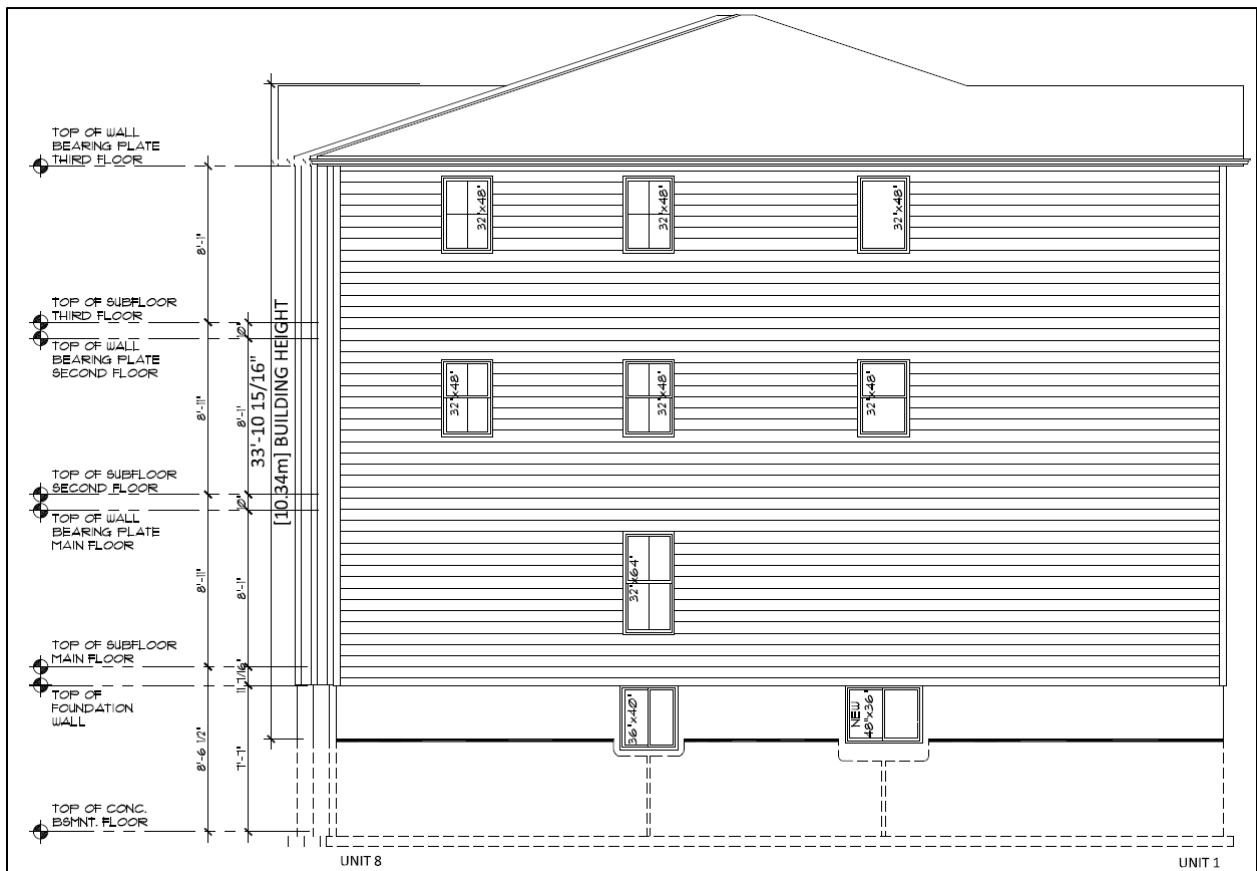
West elevation for the proposed townhouse block facing Huron Street
